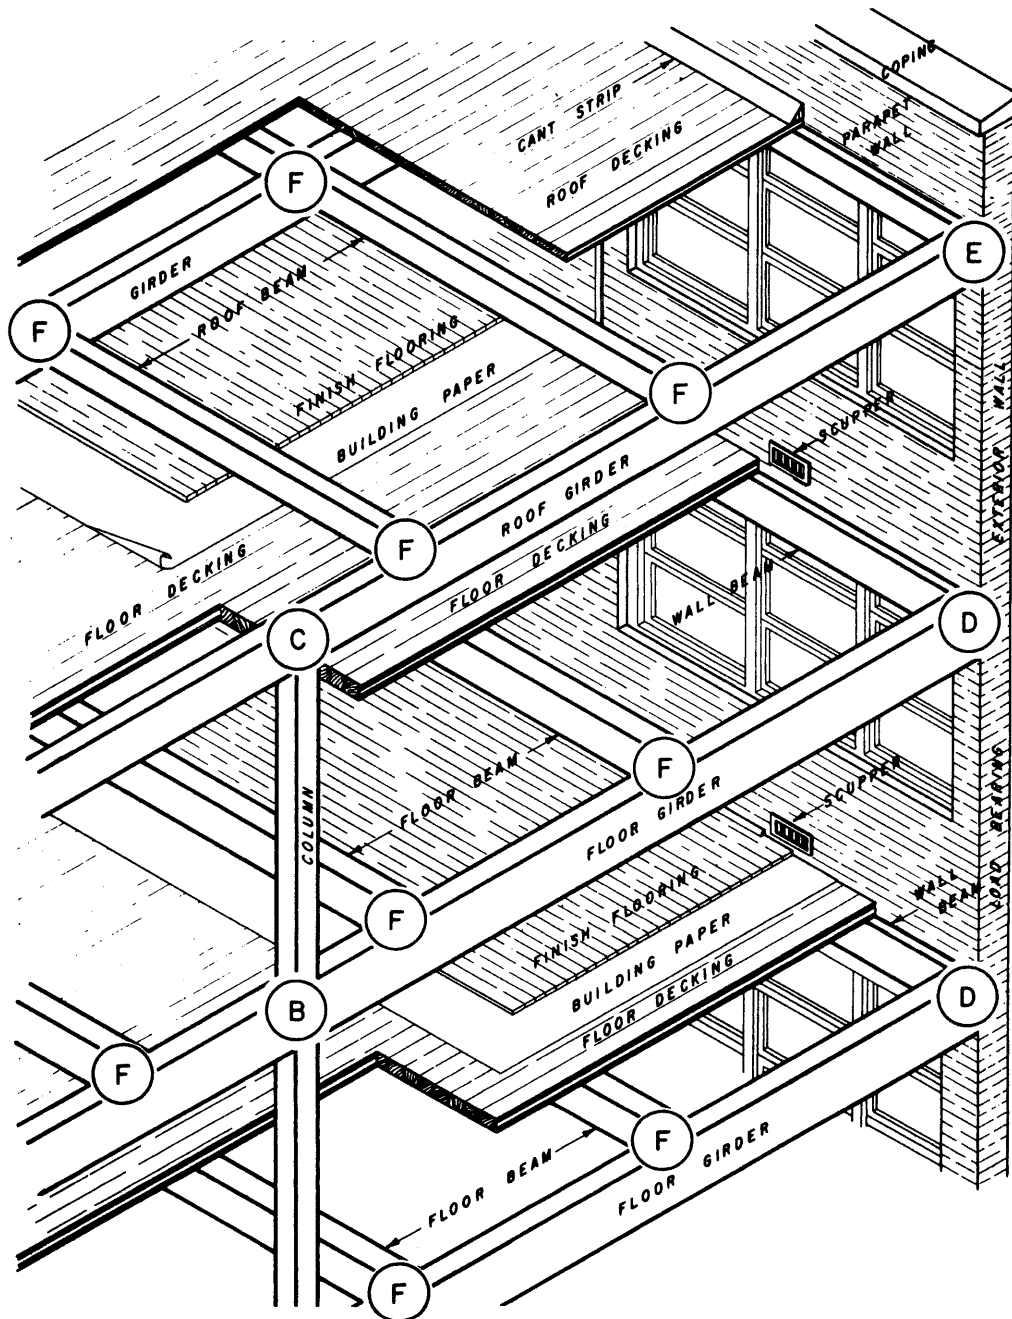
Traditional heavy timber construction. (Courtesy of American Forest and Paper Association)
